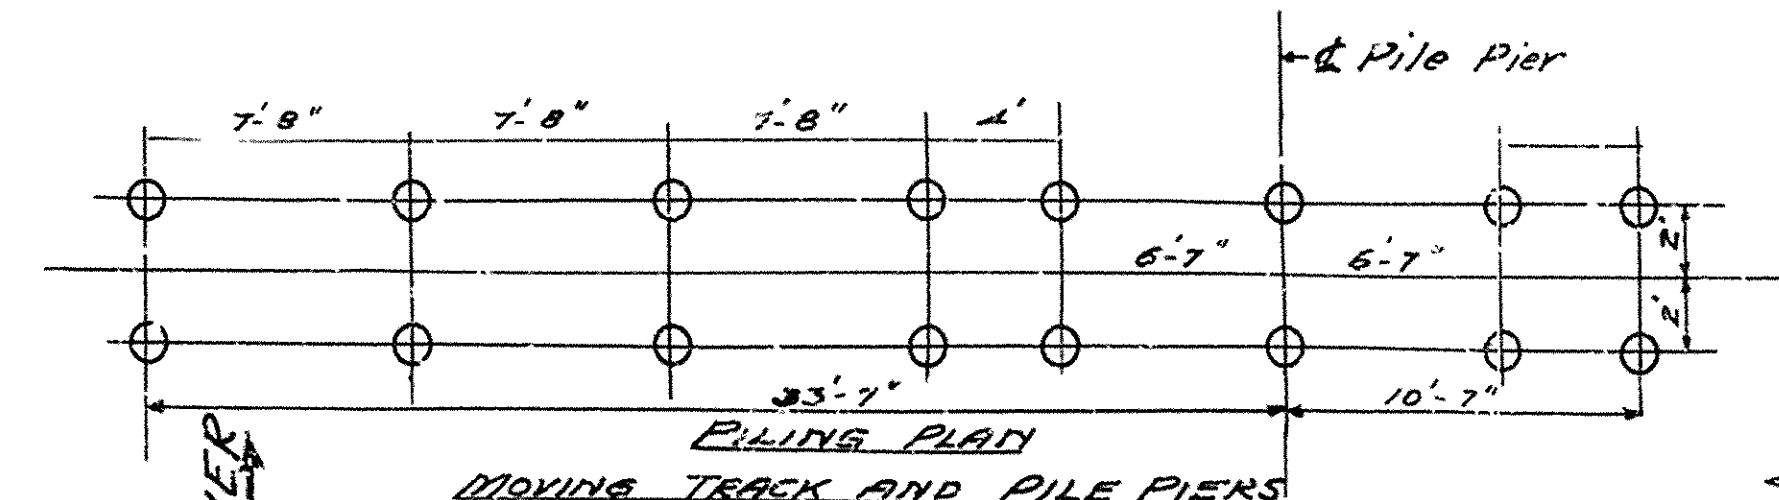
DETAILS OF PIERS 1,2,3, & 4 BRIDGE OVER CADDO RIVER CLARK COUNTY
